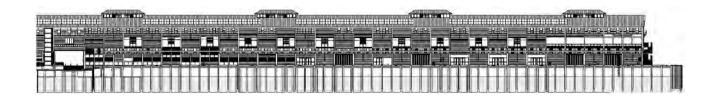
Existing and proposed east elevation to Wharf 4/5 (proposed alterations shown in blue)
